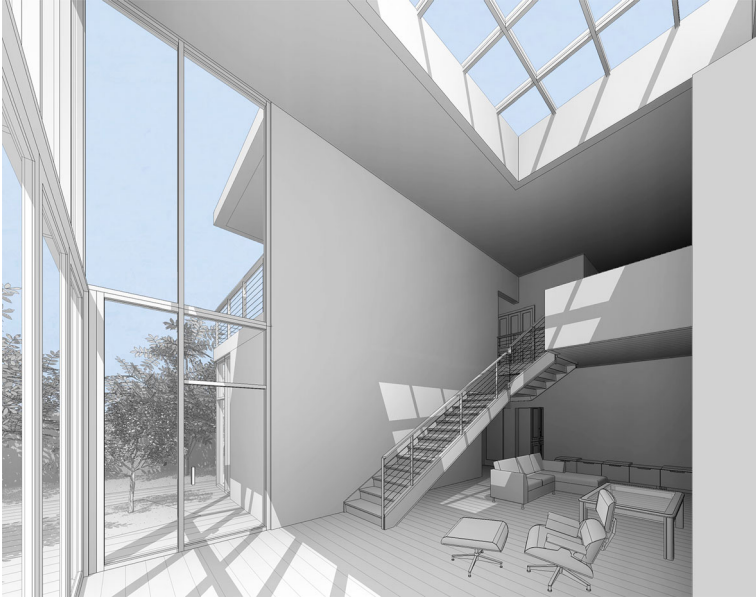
A view from entry to a living room on the ground floor and a family room on the upper floor
